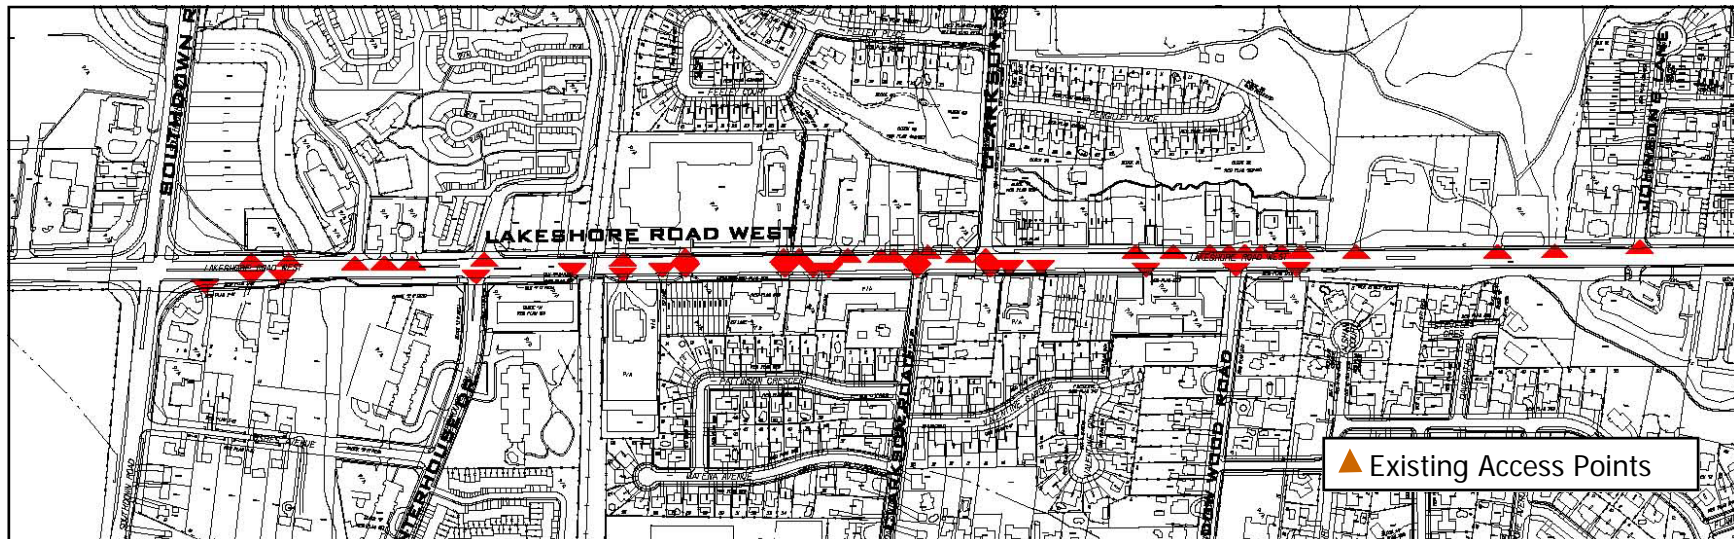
Access Points: 34 existing unsignalized driveways from Southdown Road to Johnson's Lane.
